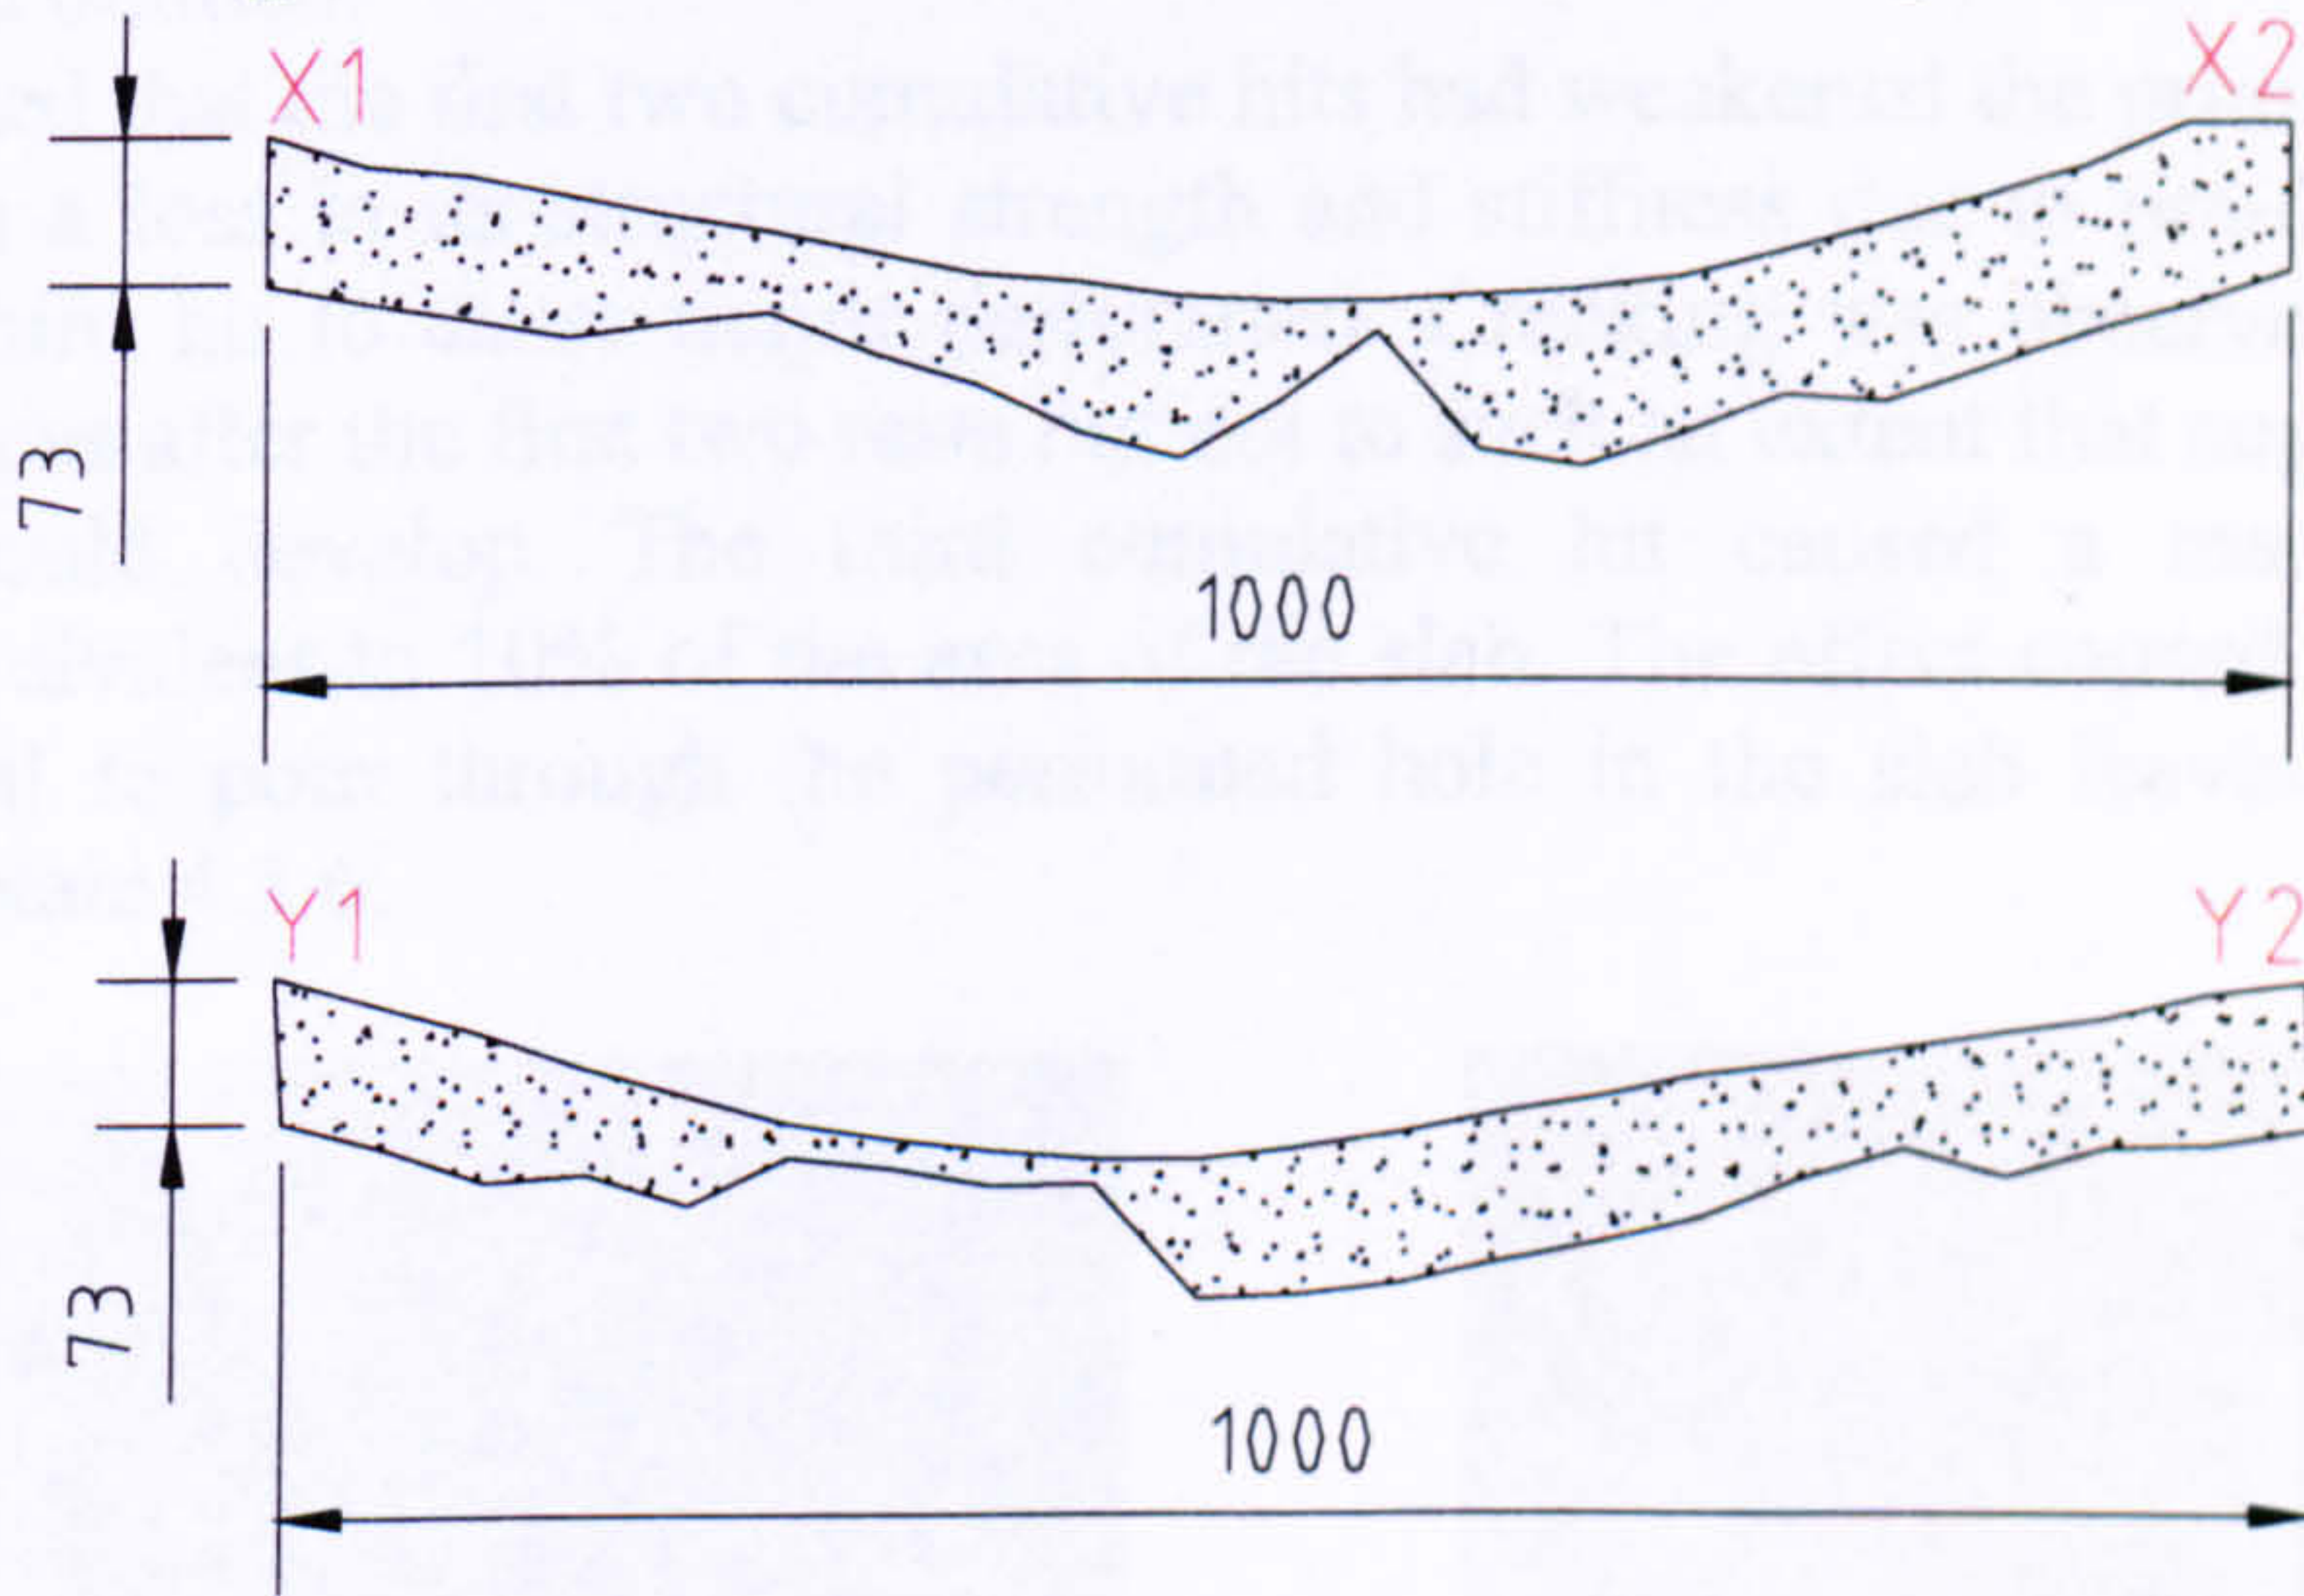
Cross-sectional elevation through X1-X2 and Y1-Y2 of primary slab RCR73IT12-13.
